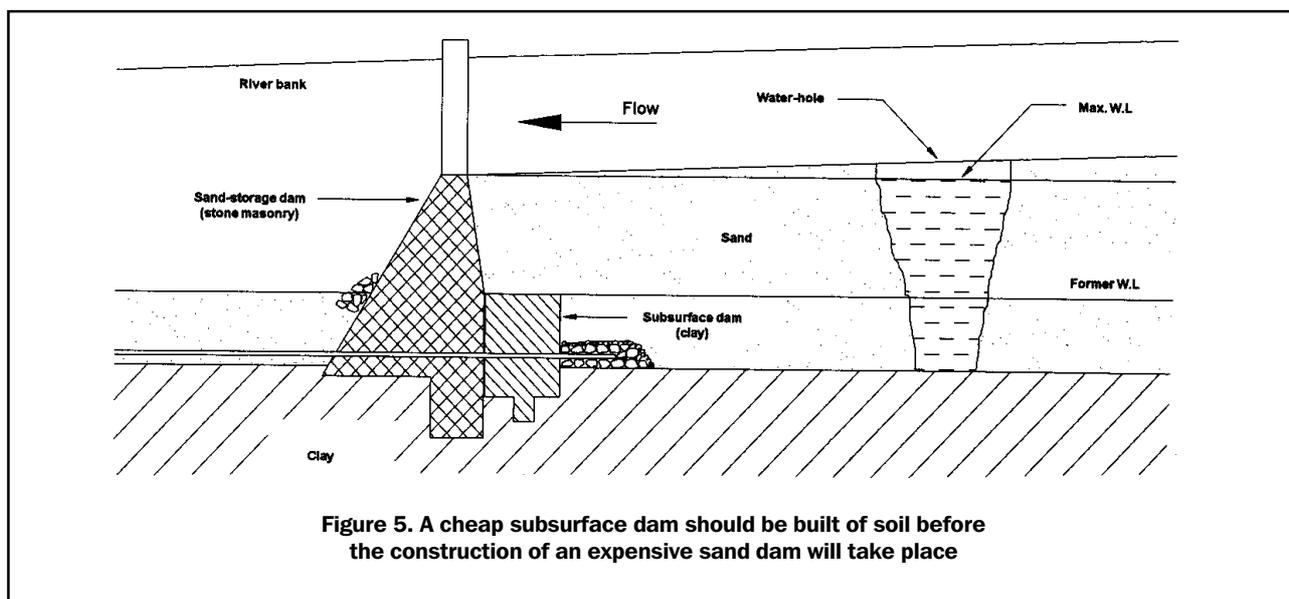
A cheap subsurface dam should be built of soil before the construction of an expensive sand dam will take place
